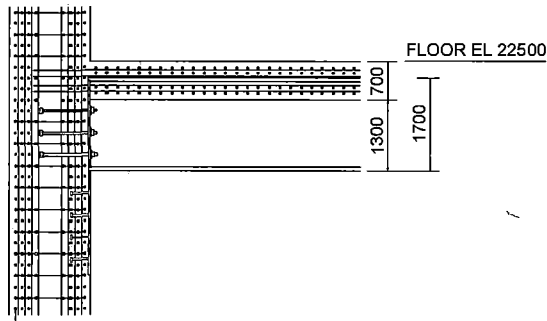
FB Reinforced Concrete Girder Reinforcing Schedule
